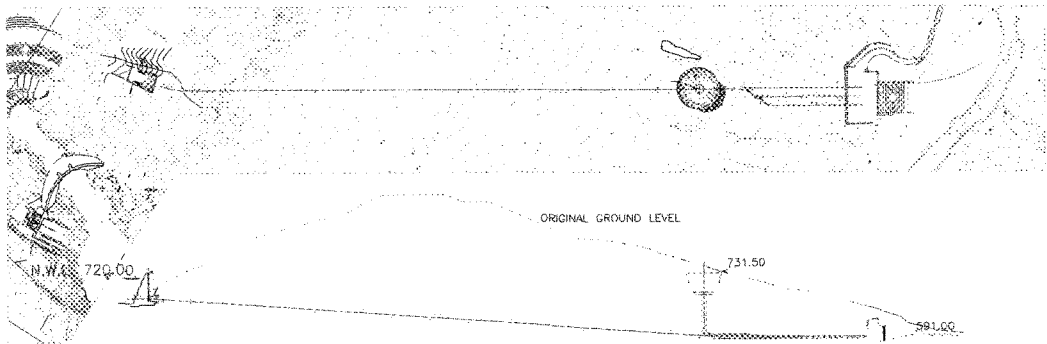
Horizontal plan and longitudinal section of pressure tunnel in Seymareh dam project.
